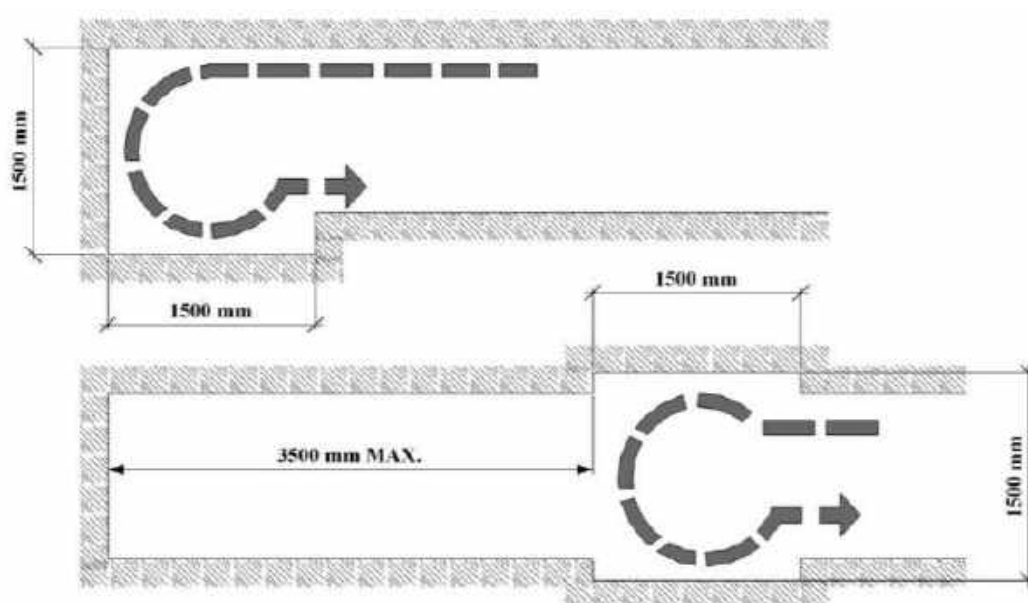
Image above shows turn around spaces with minimum dimensions of 1.50 M x 1.50 M
